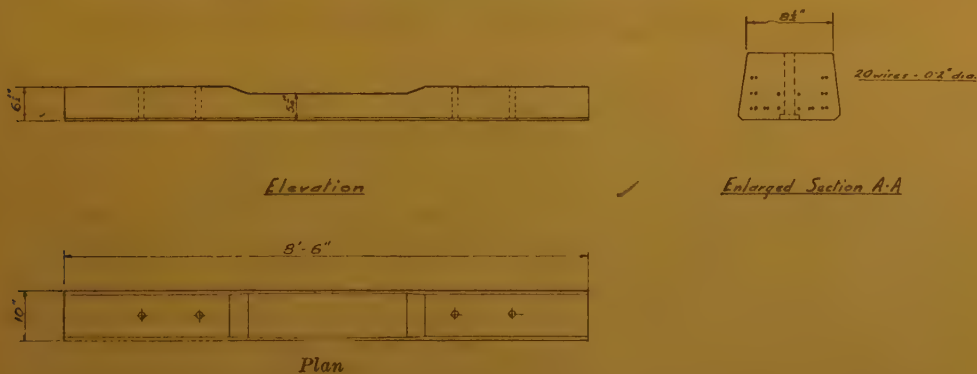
Pre-stressed concrete sleepers with bond anchorage. British Railways.
